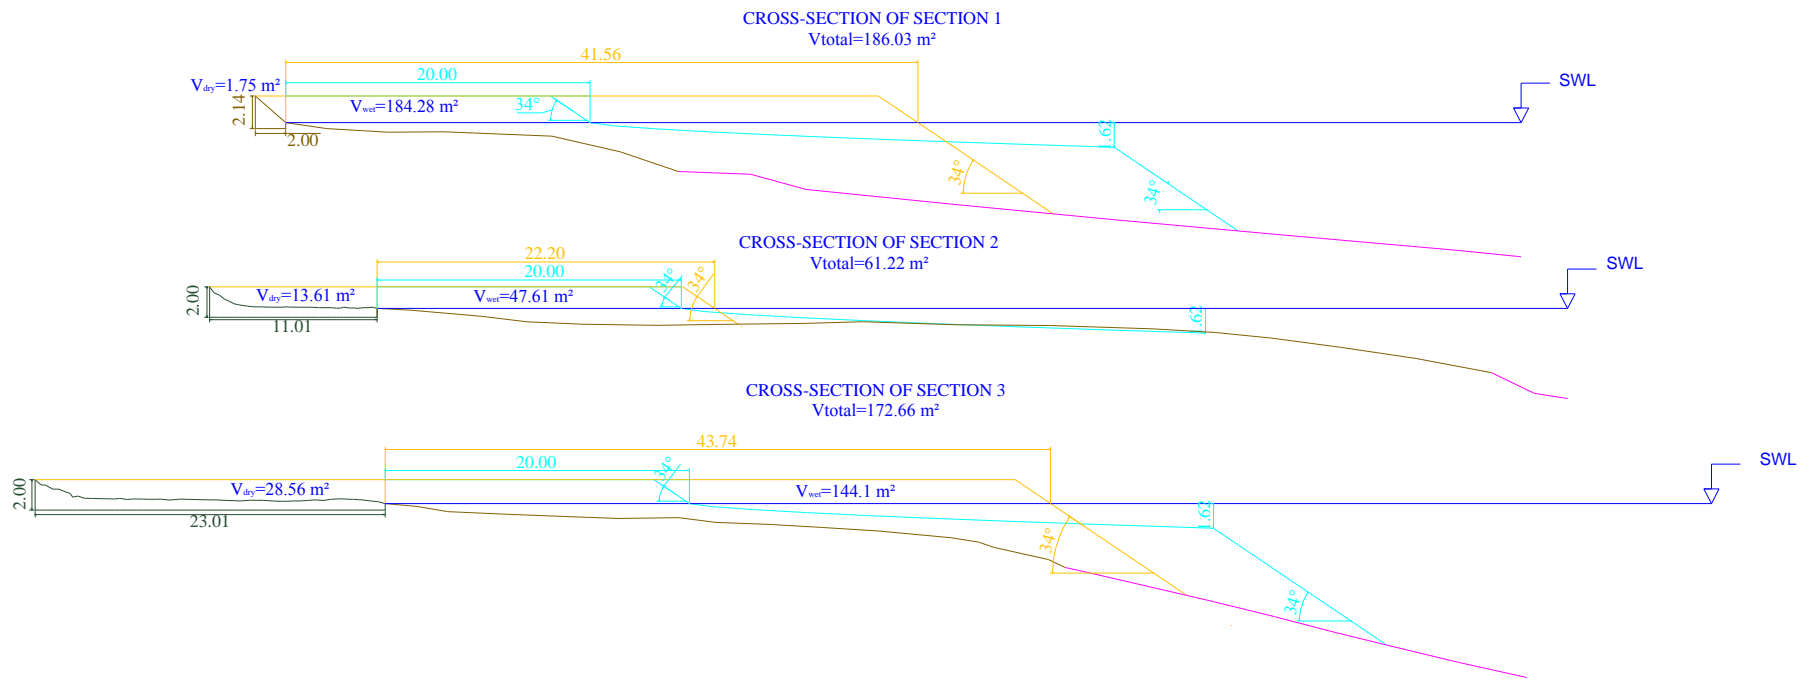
Design profiles of Section 1,2 and 3 for 20 m new dry beach width ($D_{fill}=0.45 \text{ mm}$).
